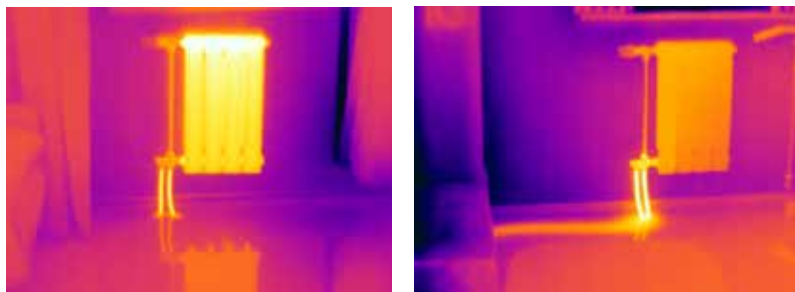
Work of the thermostatic valve on the heater. Left side: valve is opened. Right side: Valve is closed.
